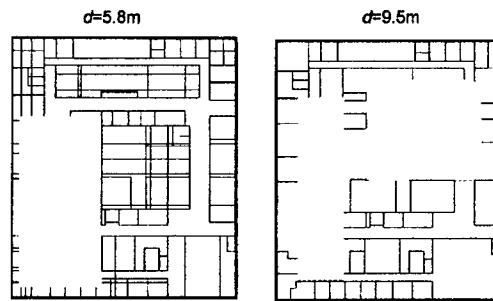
Two very non-uniform floor plan with average wall separations of 5.8m and 9.5m
